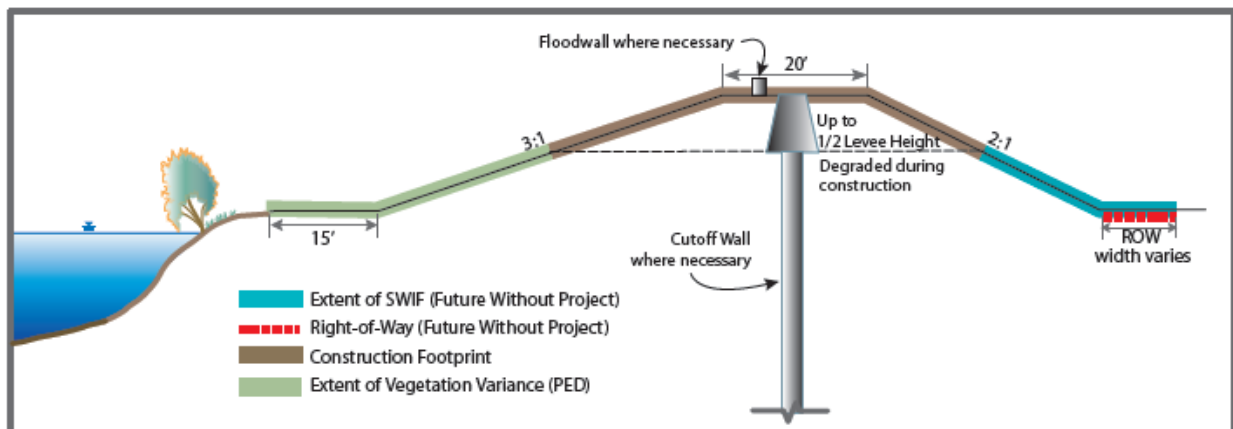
Conventional Open Trench Cutoff Wall or Floodwall Scenario.
